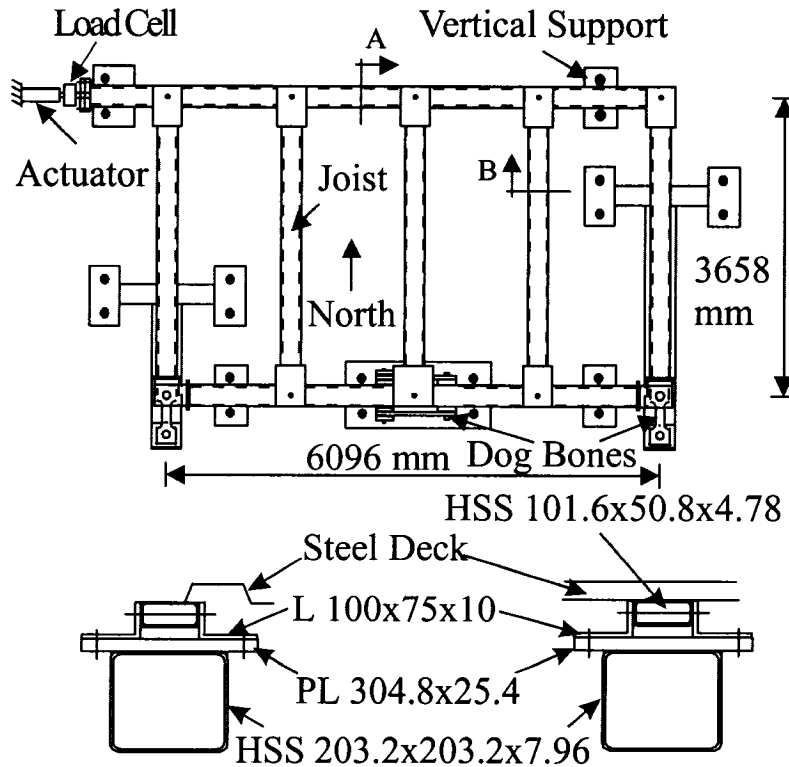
Plan view of frame setup (*Essa et al., 2001*)
